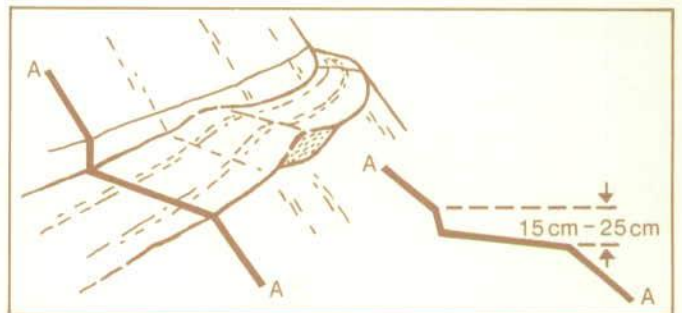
Crossfall surfacing of the road should be used instead of infalling.
